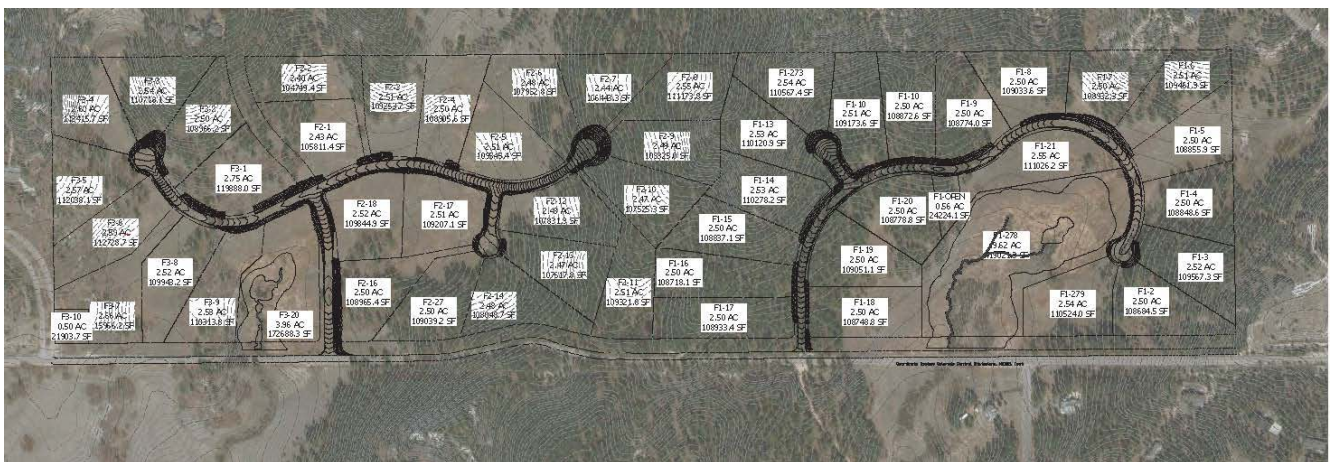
Proposed Plat showing residential planning areas and tracts. (Note: Final plan subject to change. Fire mitigation recommendations will remain the same.)
